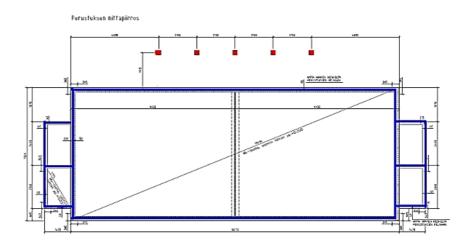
Foundations. The foundation pillars (5 pcs) are marked with red, the foundation wall (69 m) with blue.
